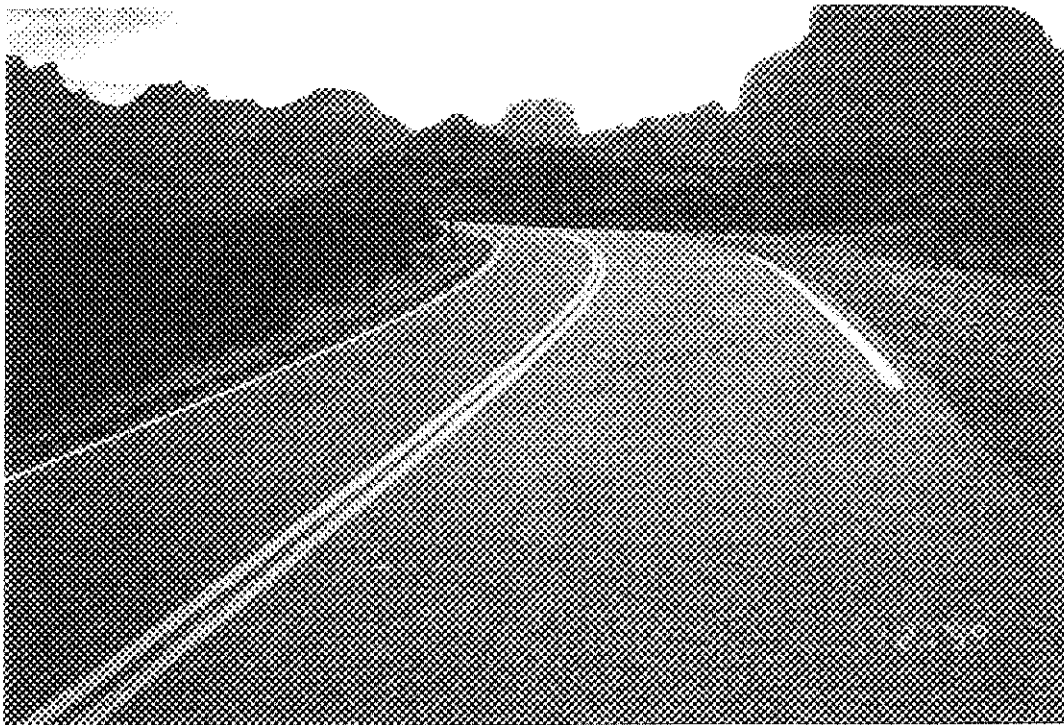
MP 0.12 - Chip seal, typical pavement section
